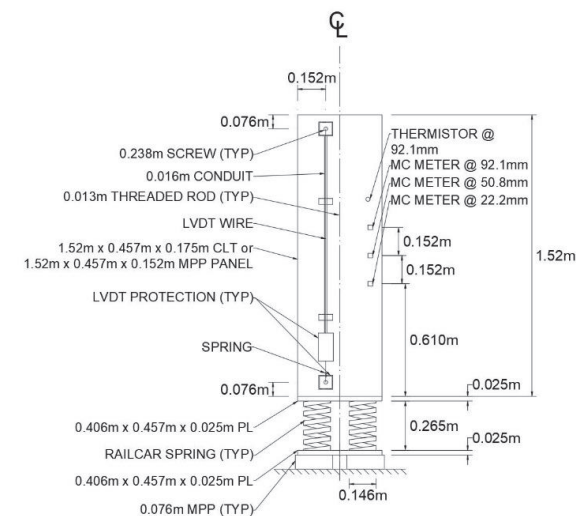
Test setup for loaded CLT specimens exposed to controlled varying environment (profile cross-section).
